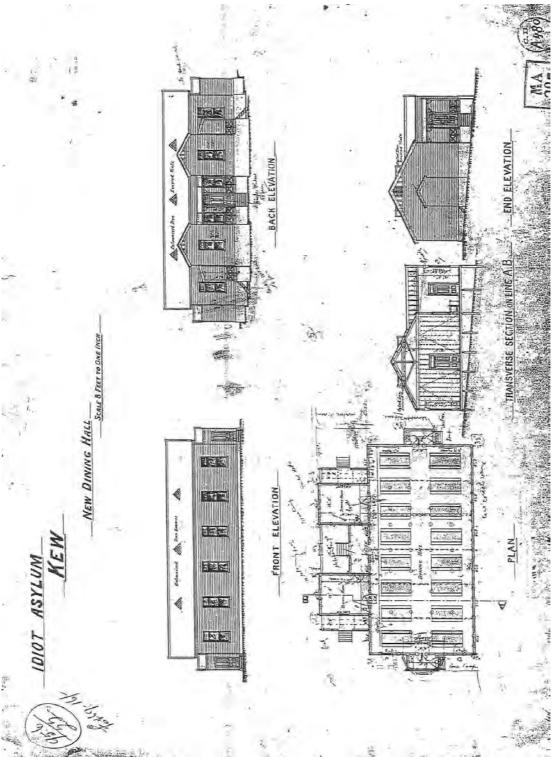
Undated plan labelled Idiot Asylum Kew New Dining Hall. This does not match the existing Dining Room B6. Source: Bryce Raworth, Kew Cottages Conservation Management Plan, September 2002, Appendix C.
